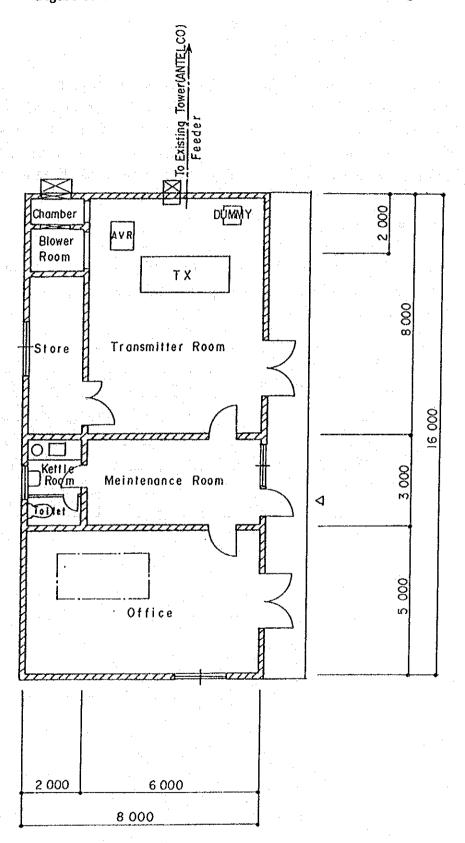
Layout Plan of Broadcasting Station in Cudad del Este.
